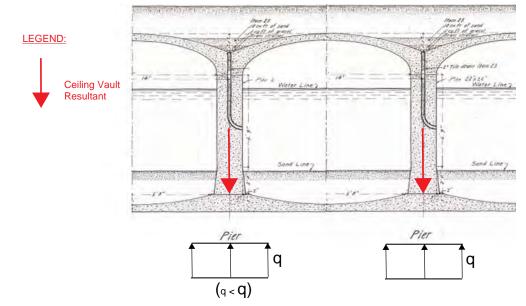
B - CRACKED FOOTING CONCRETE BEARING PRESSURE
